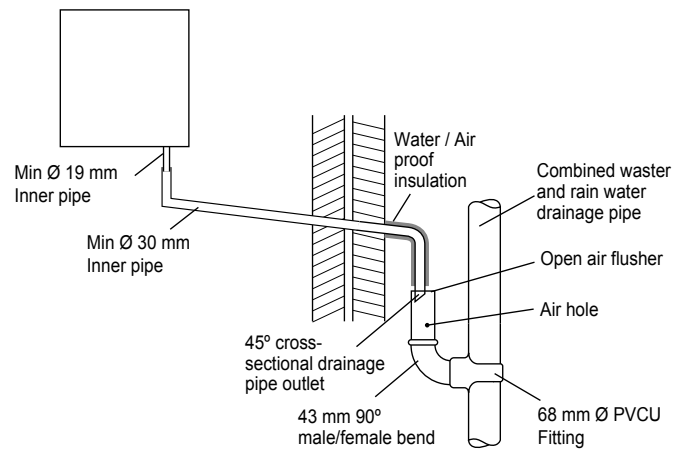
Connection of Condensate Drainage to Rain Water Drainage
